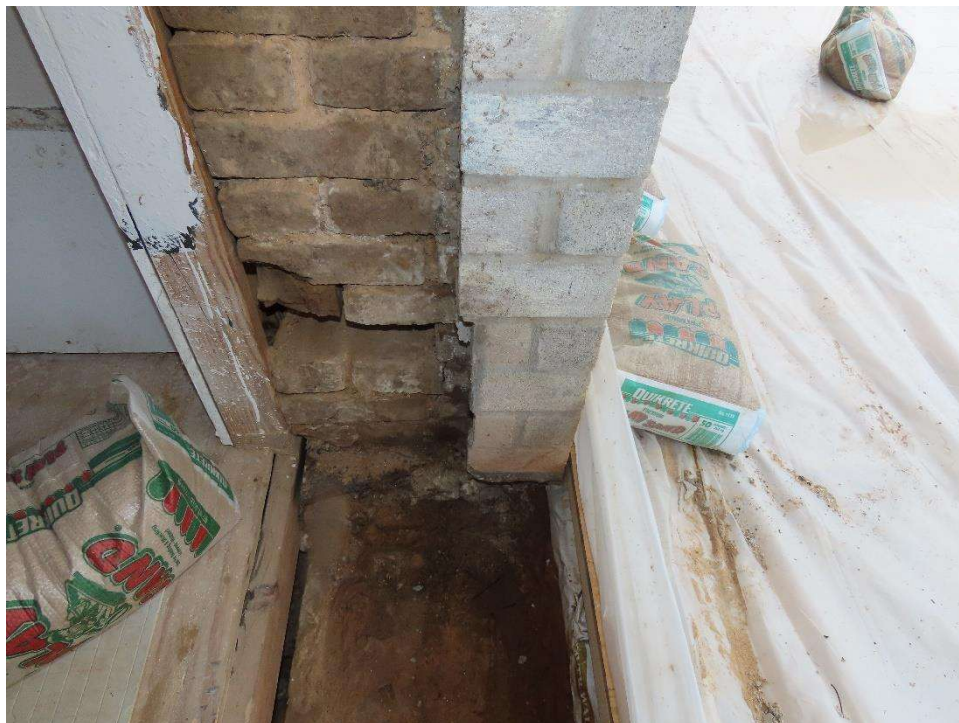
The structural brick was directly supported by the grade beam, but there was a several-inch-tall gap between the top of the grade beam and the veneer brick.
